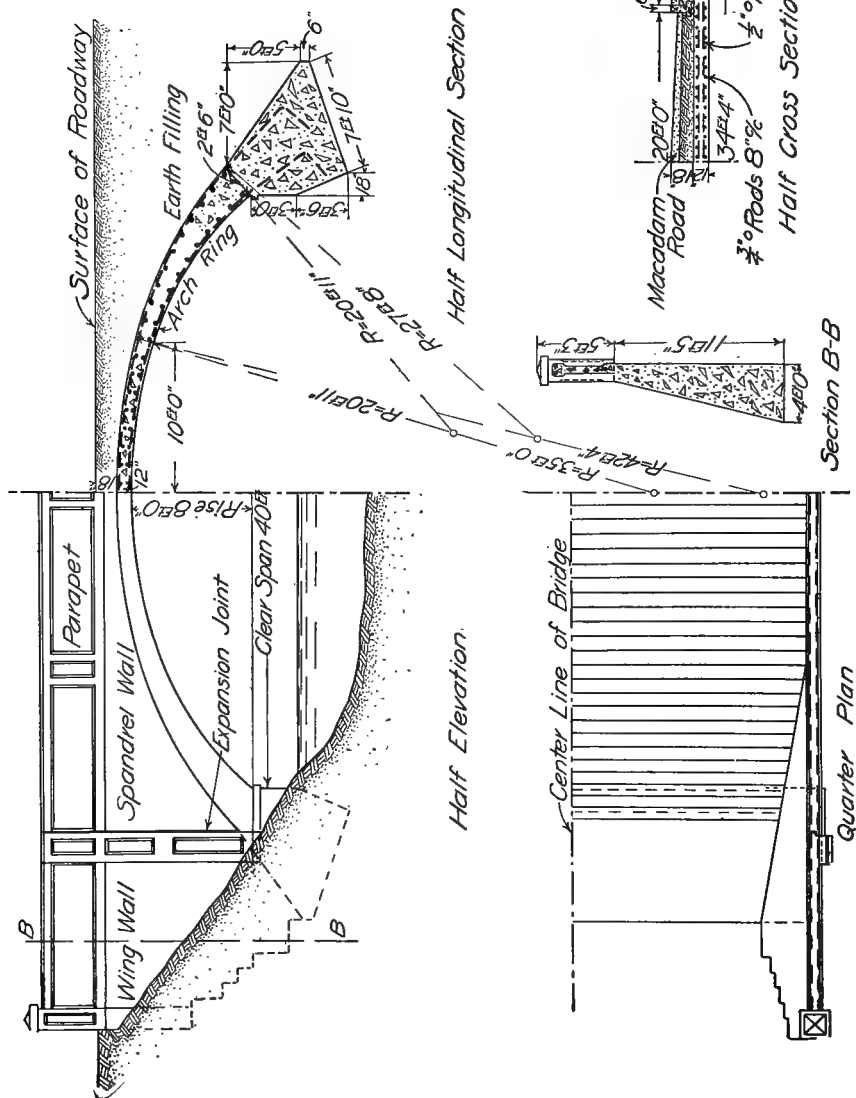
REINFORCED CONCRETE ARCH BRIDGE WITH SPAN OF 40 FEET.
